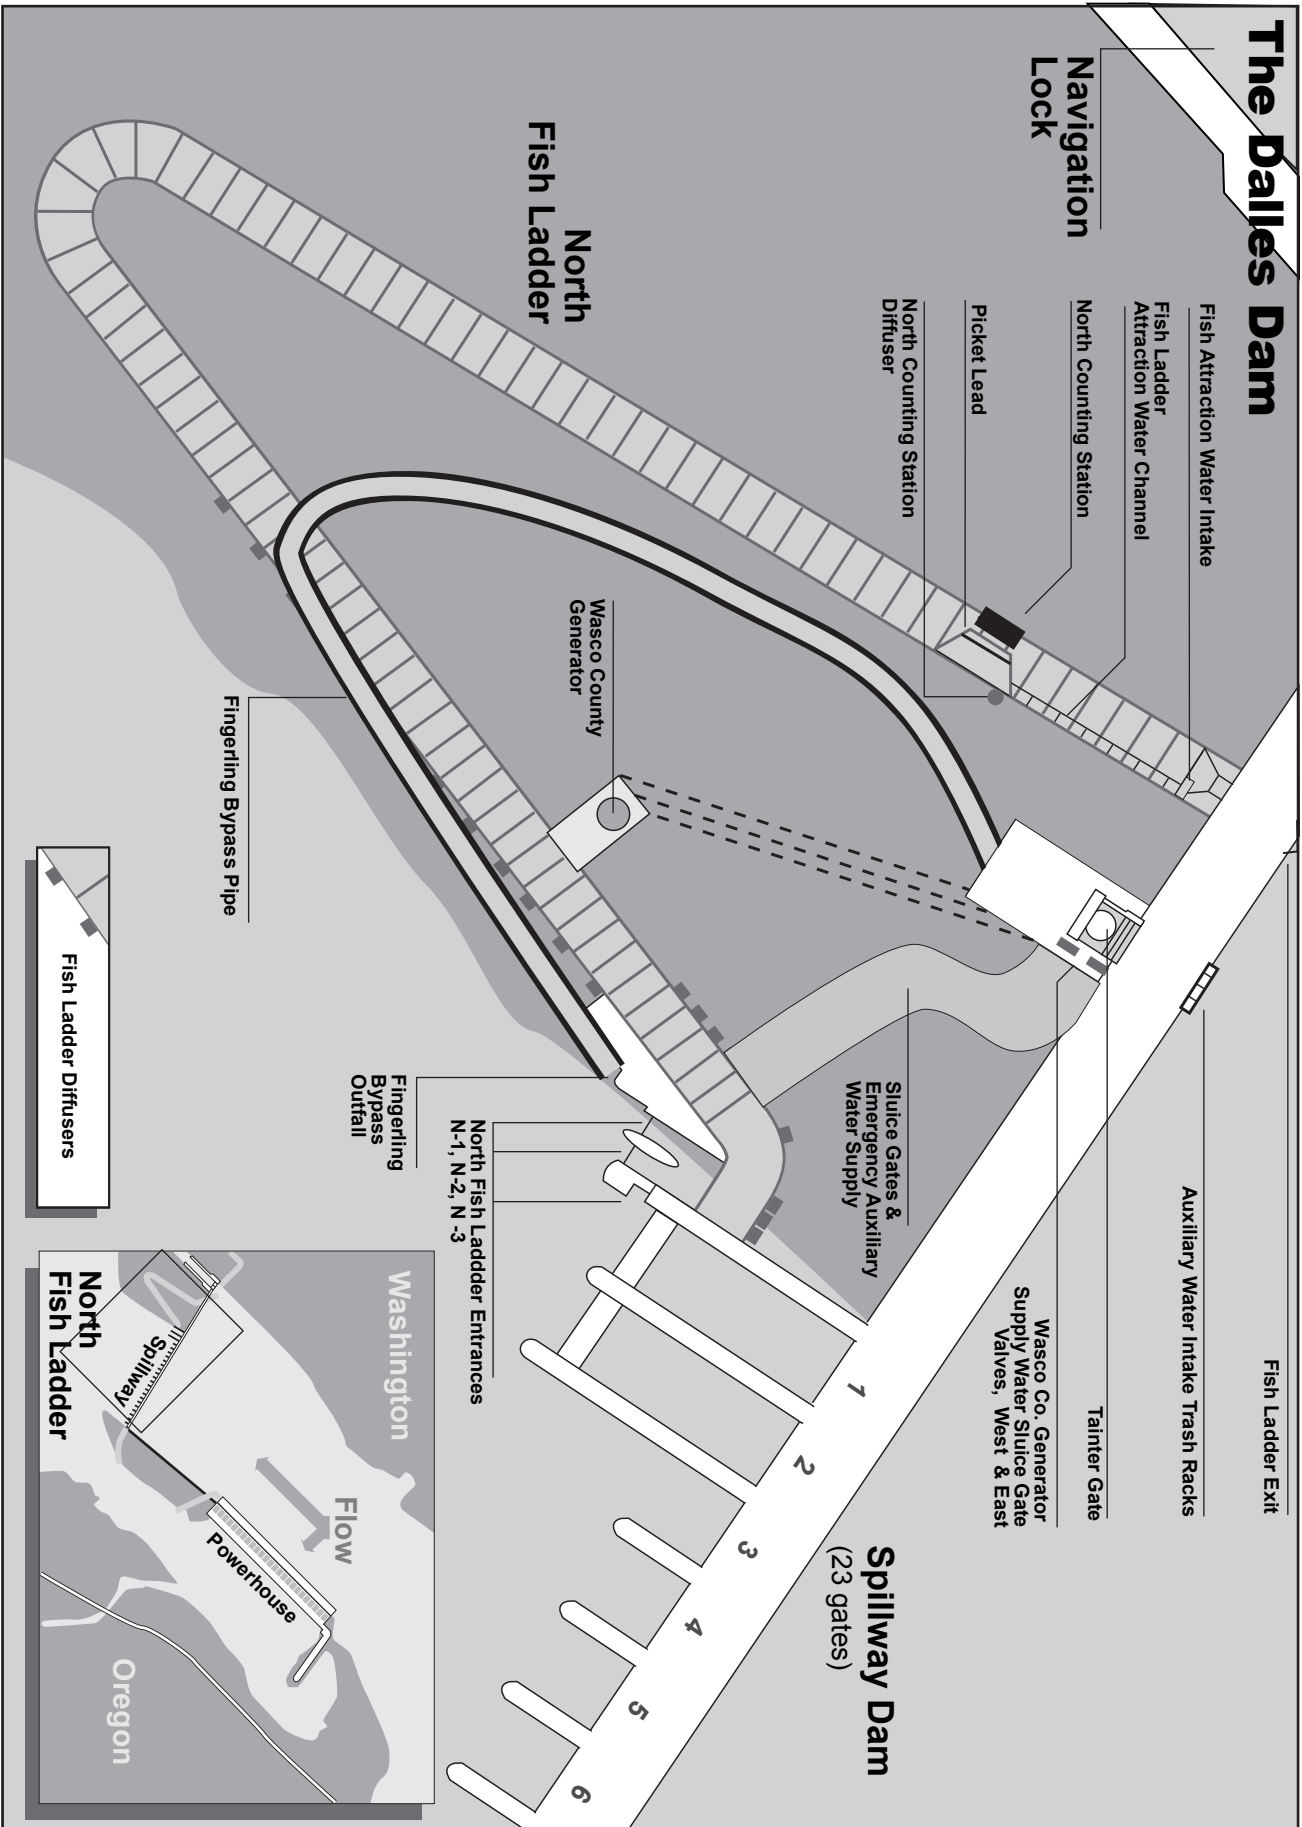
The Dalles Dam North Fish Ladder and Spillway
